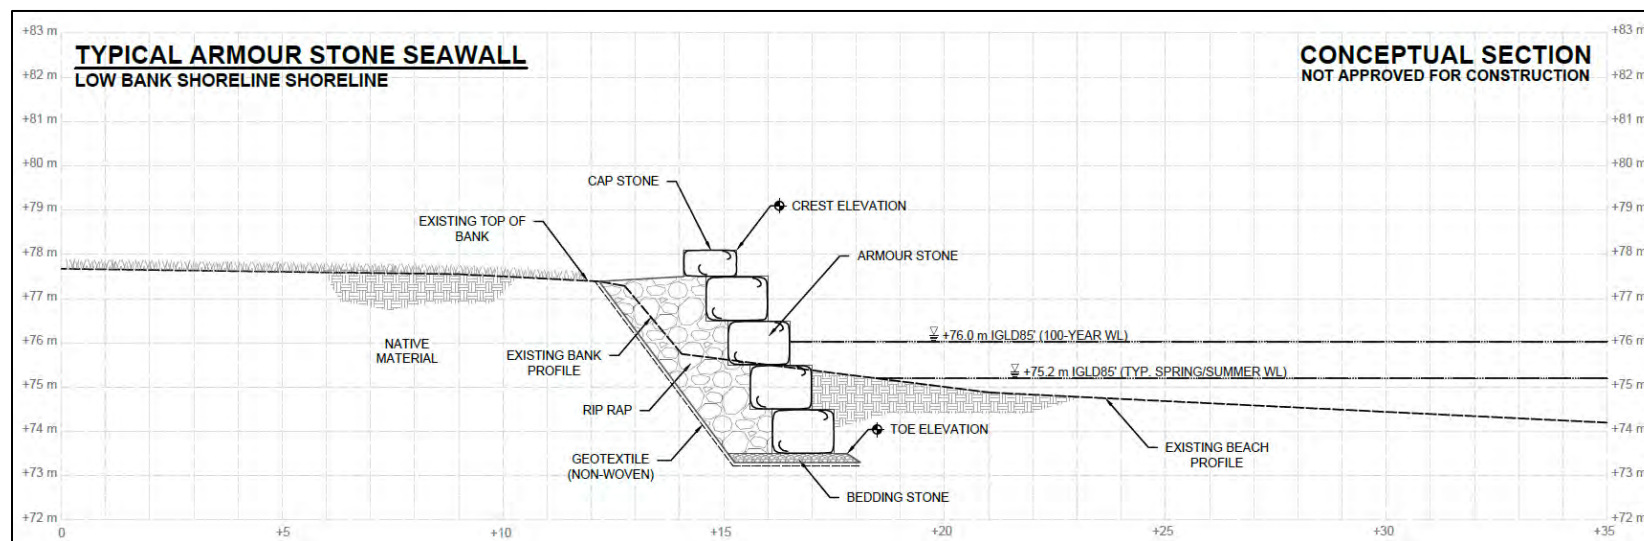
Recommended Typical Armour Stone Seawall Concept for a Low Bank (<3 m)
